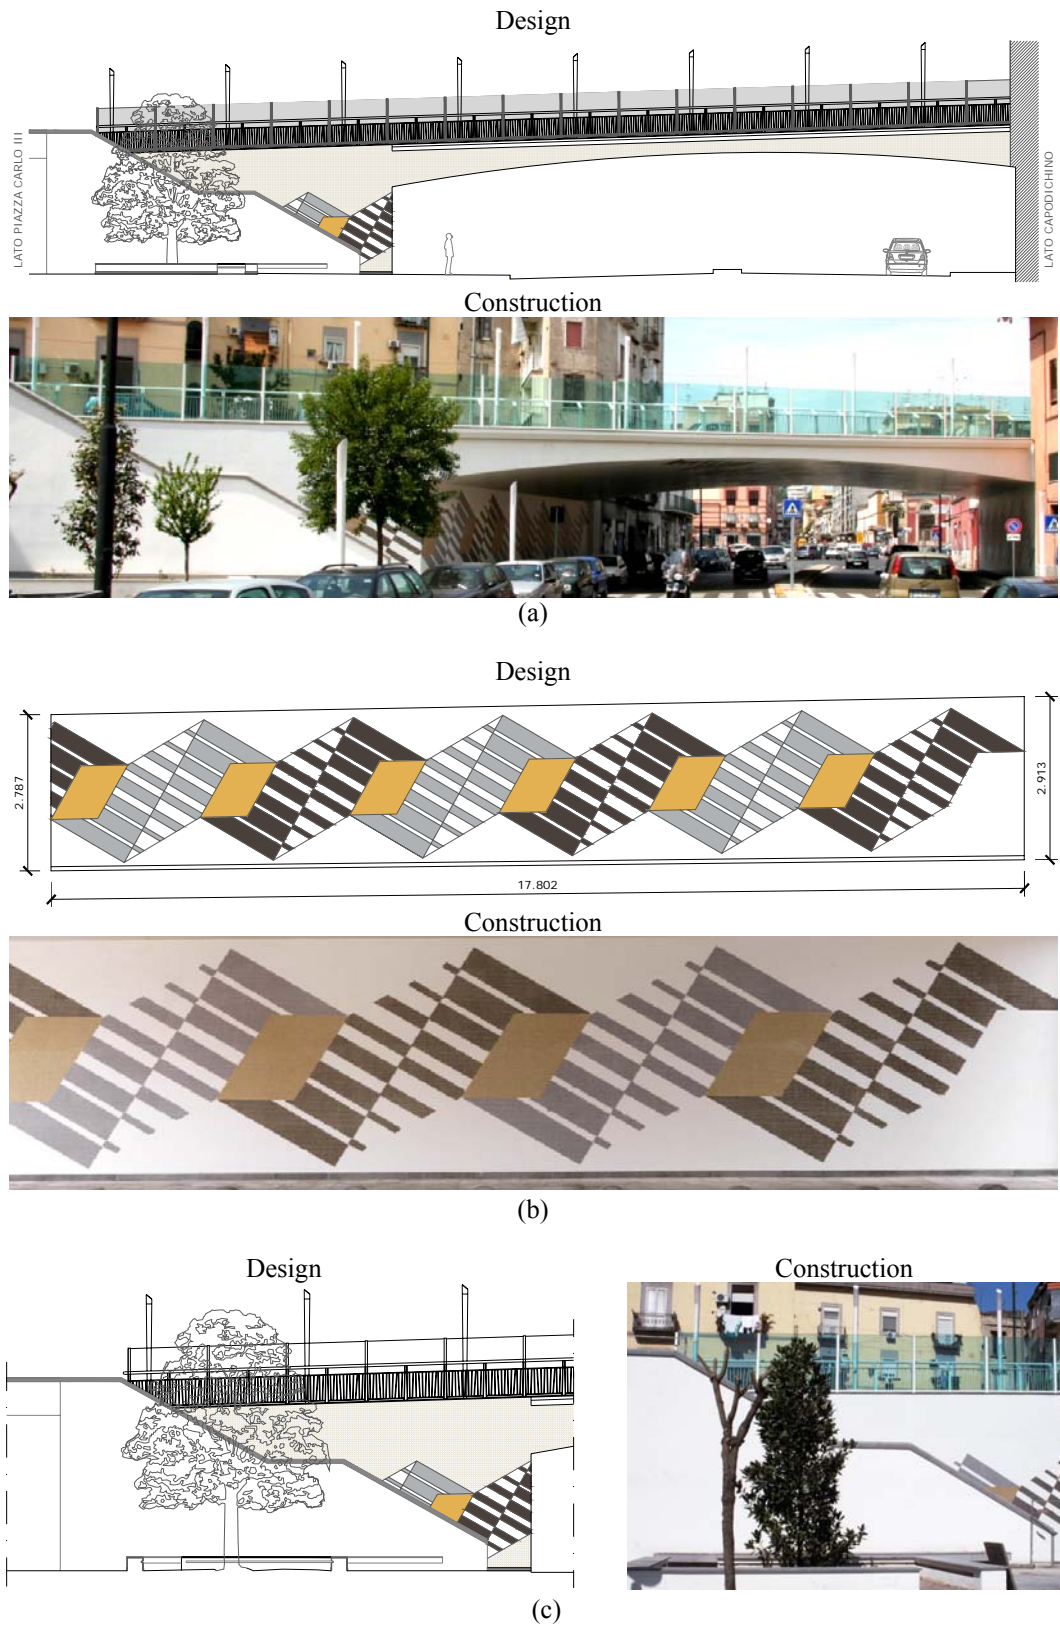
The bridge as designed vs as built : (a) The Elevation, (b) The Abutment, (c) The stairs.
